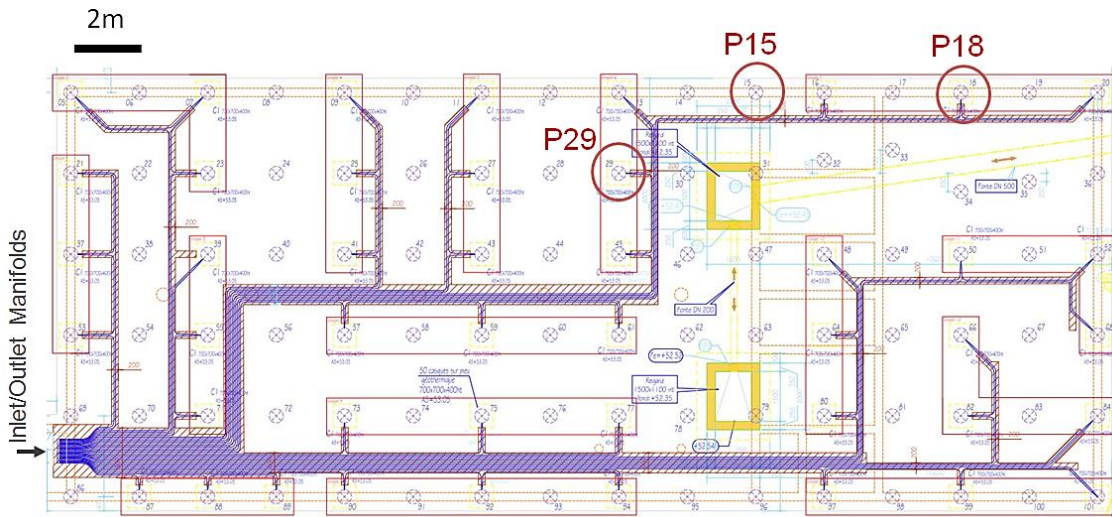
The position of the three instrumented piles P15, P18 and P29 on the geothermal network plan.
